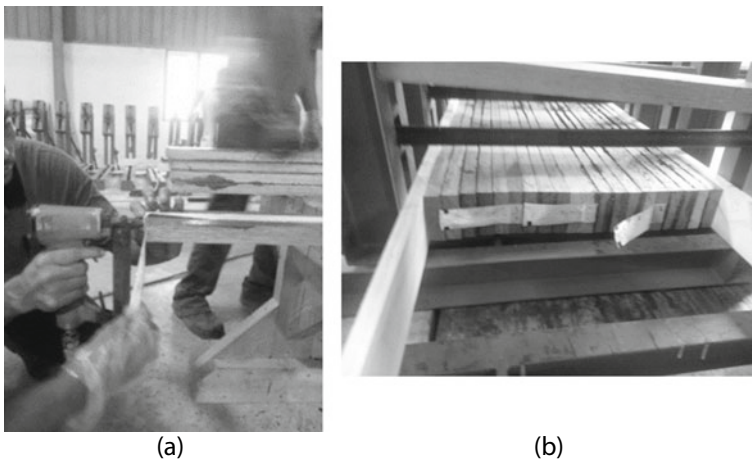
Installation of the GFRP reinforcement; a GRFP strip laid between glulam lamellas b Glulam beam compressed after the GFRP strip installed
